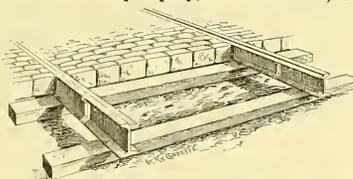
Track Construction of Nassau Traction Company, Showing Electric Welding.
